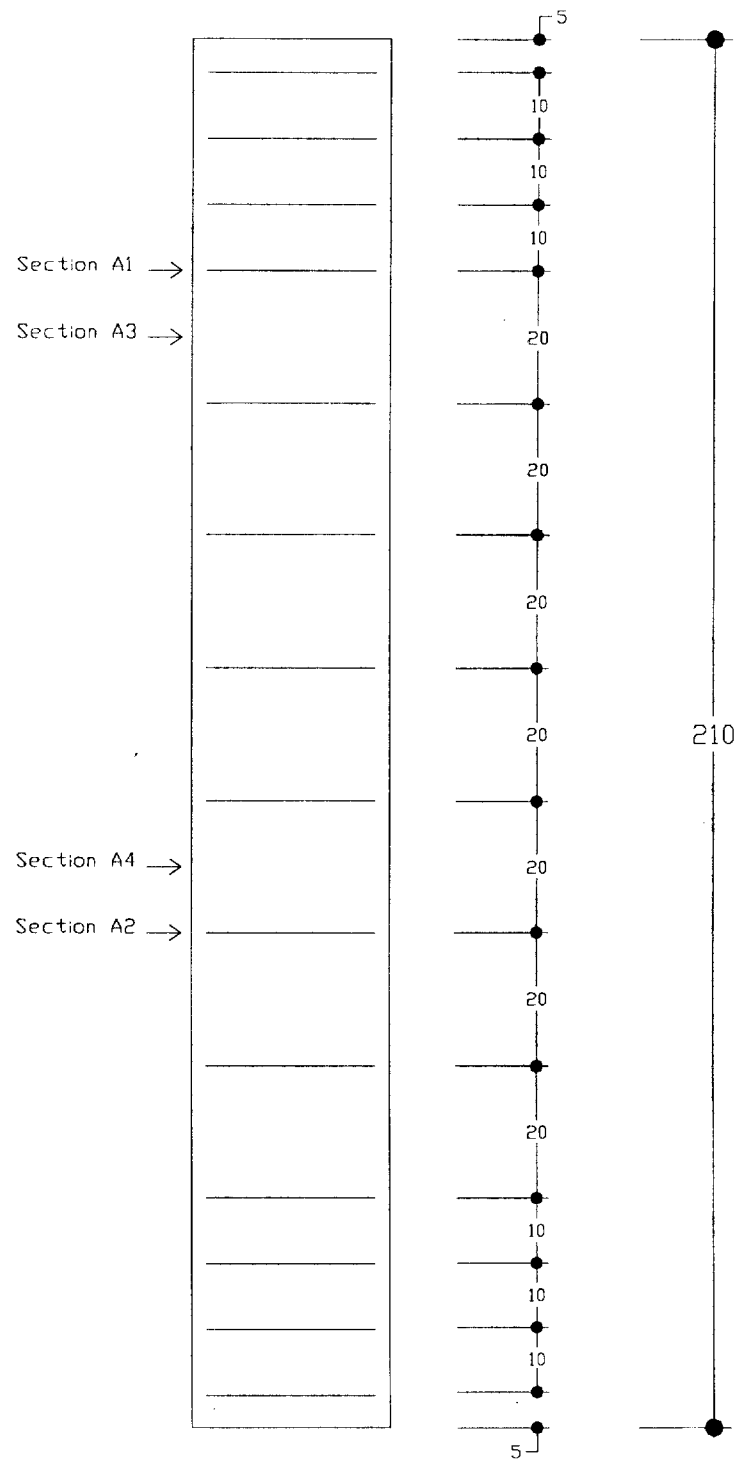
Section type 2 and 3. Position of thermocouples. Column used for fire test. Note: A1 and A2 sections with stirrups, A3 and A4 sections without stirrups
